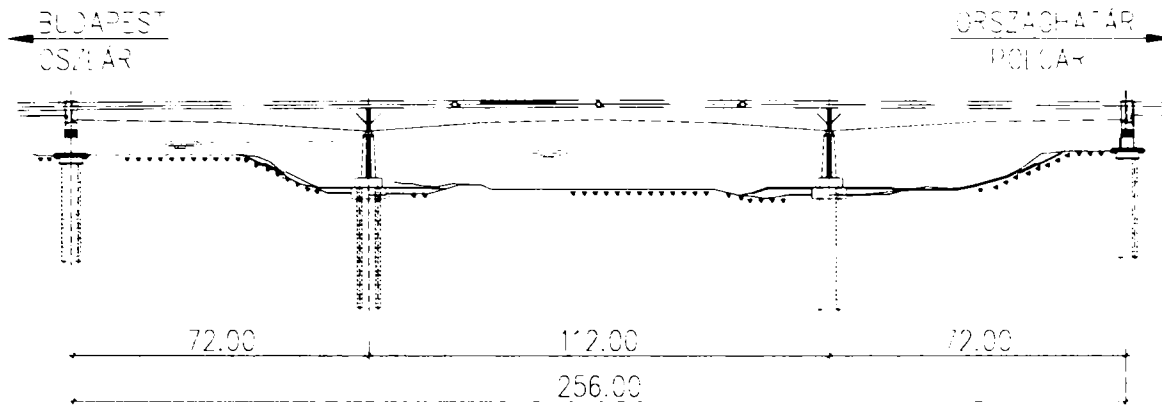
The elevation drawing of the main bridge at Oszlár over the river Tisza
